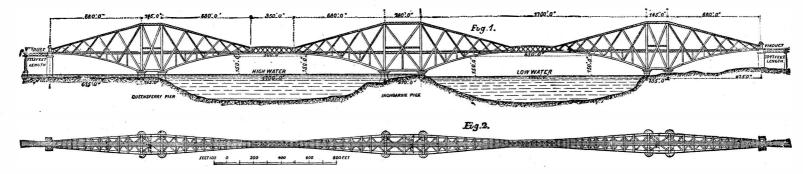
THE FORTH BRIDGE.—ELEVATION AND PLAN.
